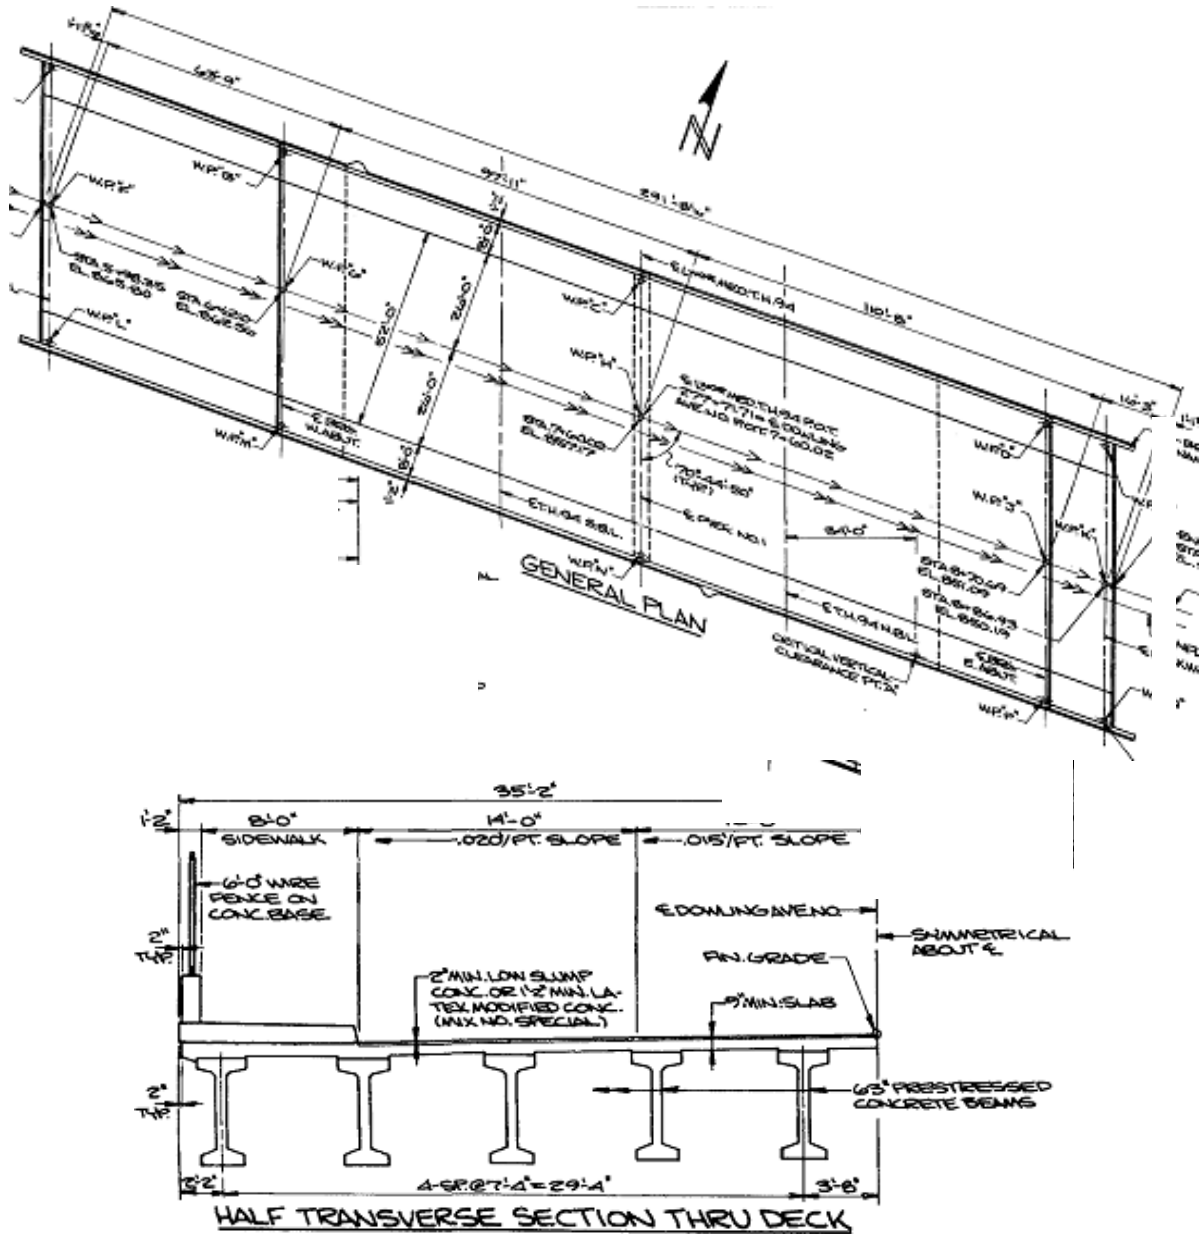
Plan view (above) and cross section (below), bridge 27812.
